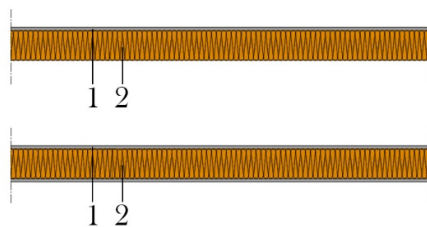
Section of single-layer and double-layer element of Adingterm panels¹
